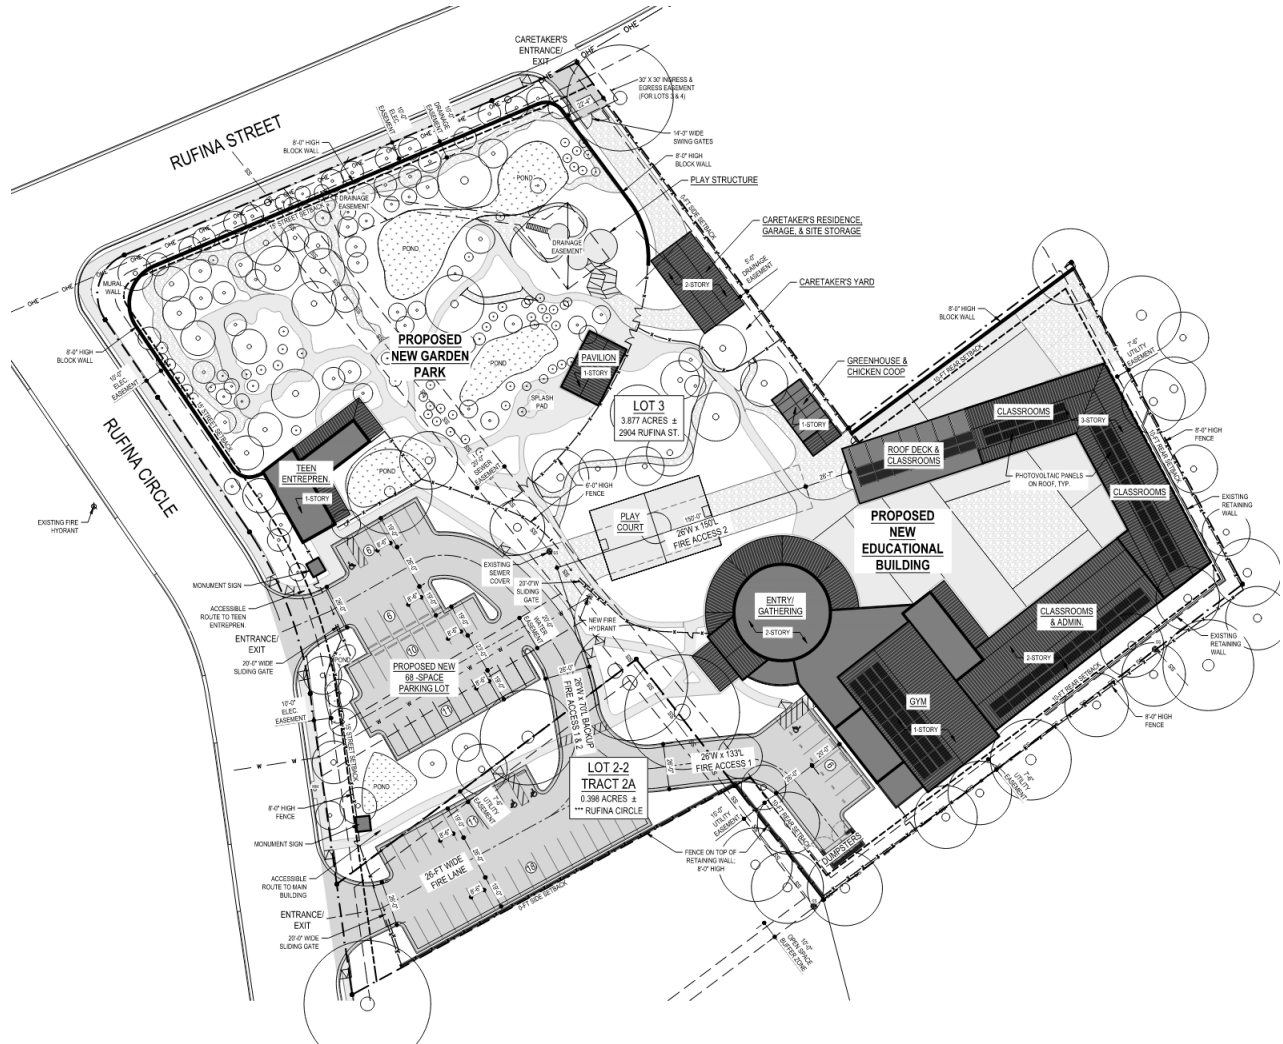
Proposed Site Master Plan. See full site plans in Attachment C-6.
